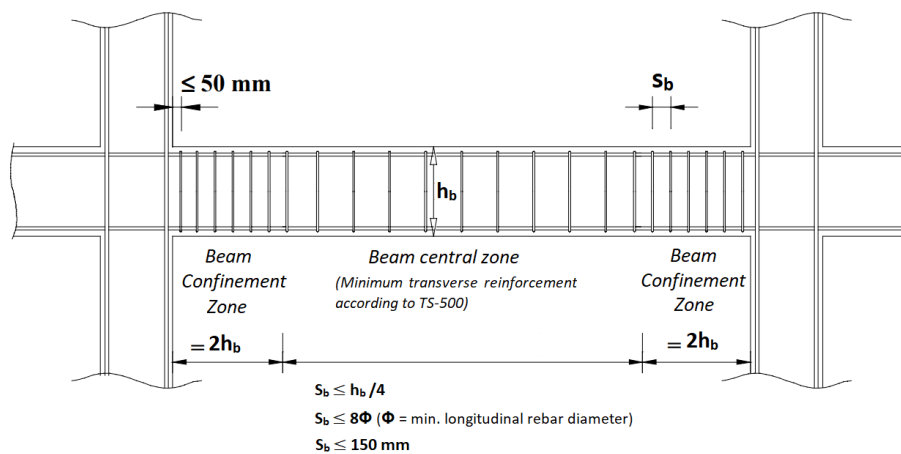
Transverse Reinforcement Requirements for beam (TEC, 1998).
